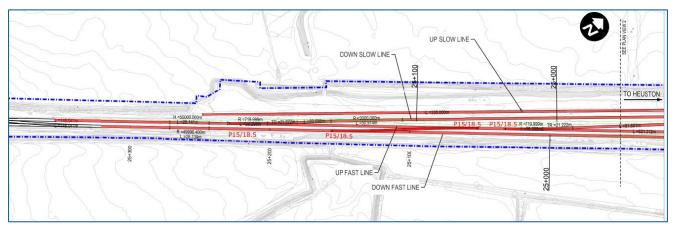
Hazelhatch & Celbridge Station – Track Plan Layout (3 of 3)
